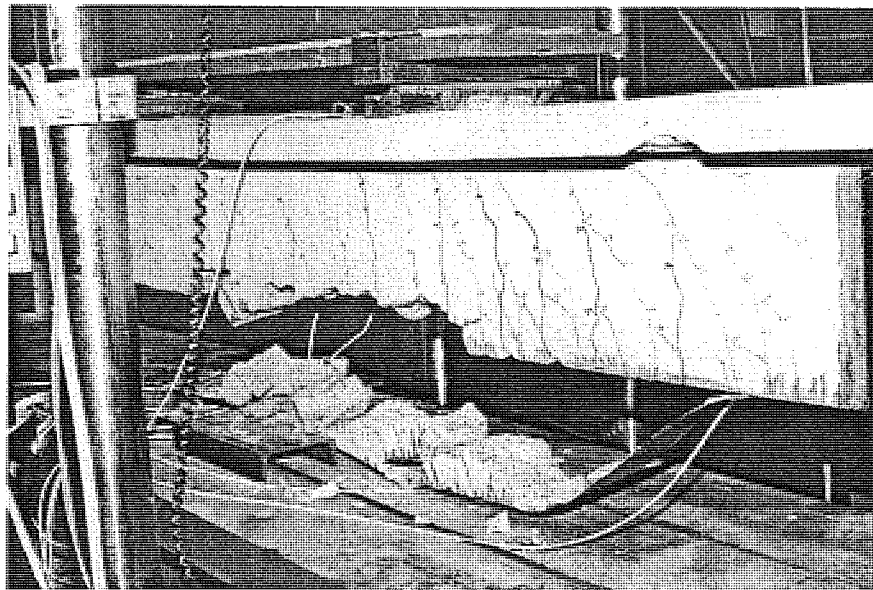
Interfacial shear failure of concrete in Beam No. 3.
